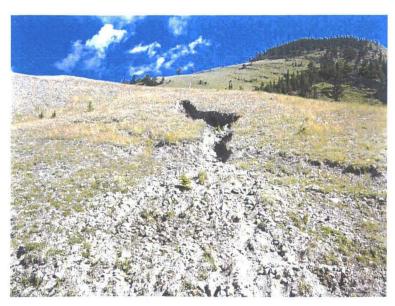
(bottom) – July 2005 – Gully erosion due to surface runoff on the slope above the road, immediately east of the retaining wall above the road. The eroded soil has been deposited in the ditch at the toe of the slope and partially blocked the culvert shown in Photos 4 and 5.
